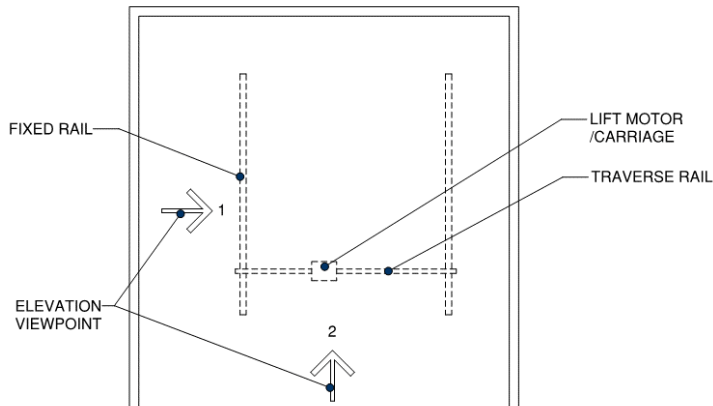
This view represents all visible elements from the floor plane to about 3 feet above the floor plane. Ceiling-mounted elements that require coordination with floor plan elements such as privacy curtains, booms, and overhead lift systems are typically represented as dashed lines. For this diagram, elevation (side) views are shown with arrows pointing in the direction of view.
